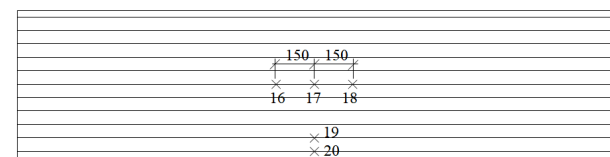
Arrangement of strain gauges of the reinforcement bars in the floor slab
